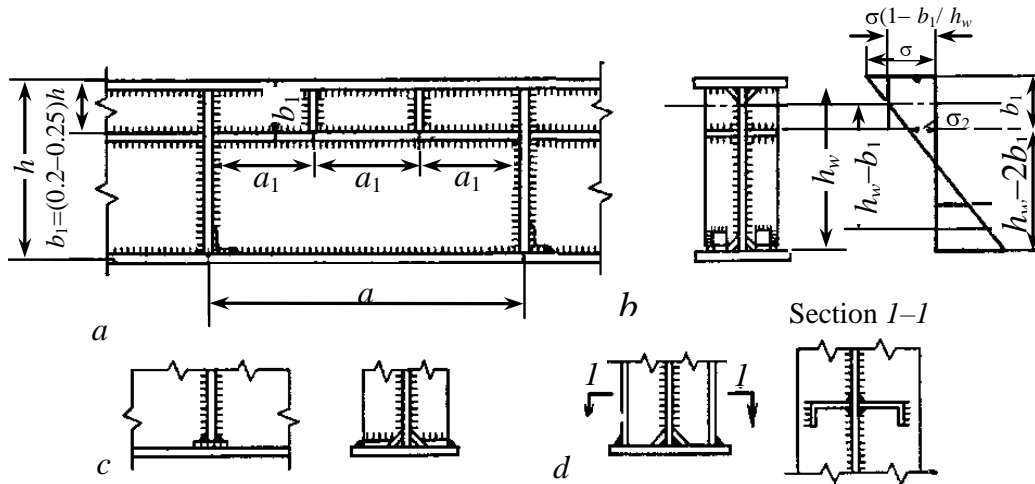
Bracing of crane girder web with longitudinal stiffener, and details of ribs
